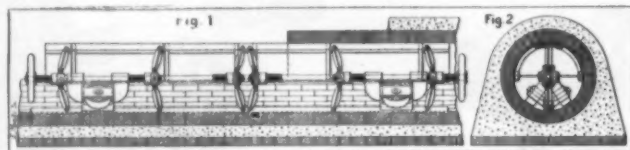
LONGITUDINAL SECTION OF THE ROBERTS CENTERING. FIG. 2.—TRANSVERSE SECTION.
